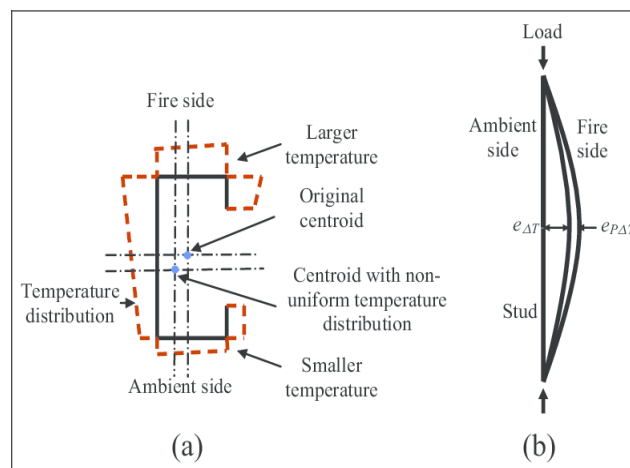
LSF Wall and the steel stud cross section[91] .
